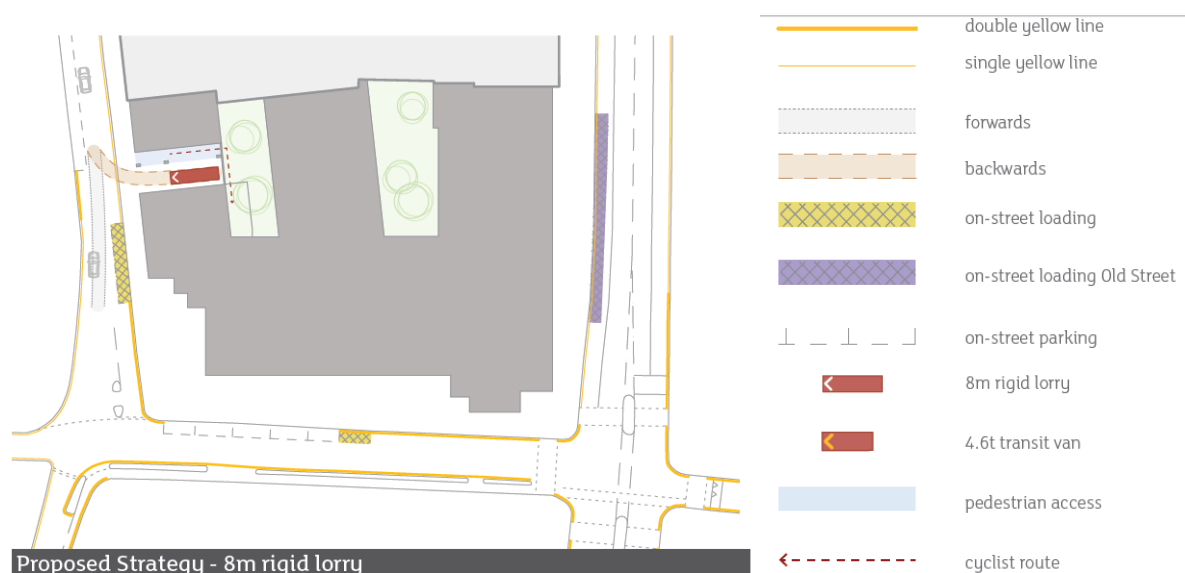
Illustrating internal loading bay accessed off Banner Street and on-street loading bays on Old Street, Banner Street and Bunhill Row.
